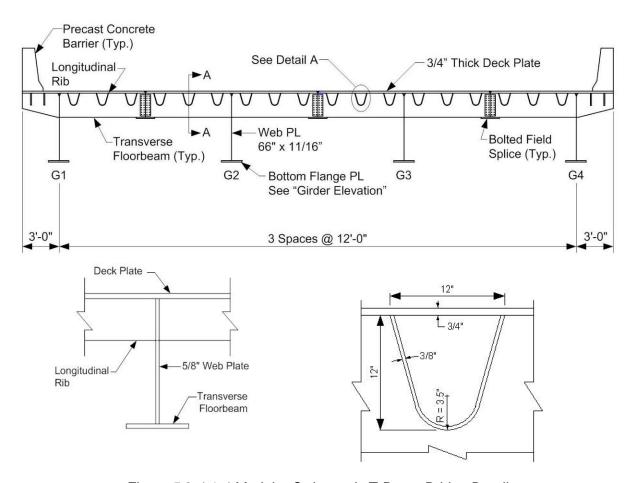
Modular Orthotropic T-Beam Bridge Details
